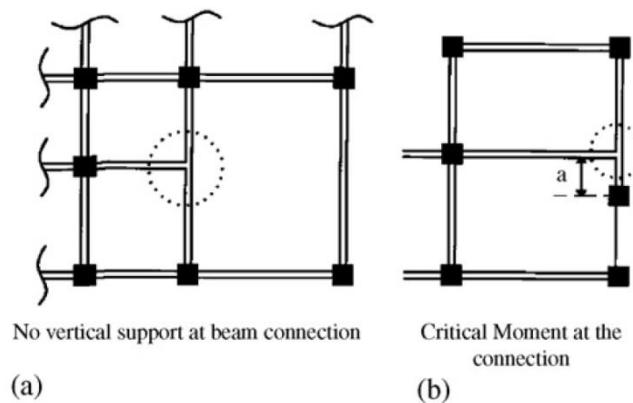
Beams Intersecting Without Vertical Supports (Ozmen and Unay, 2007)
